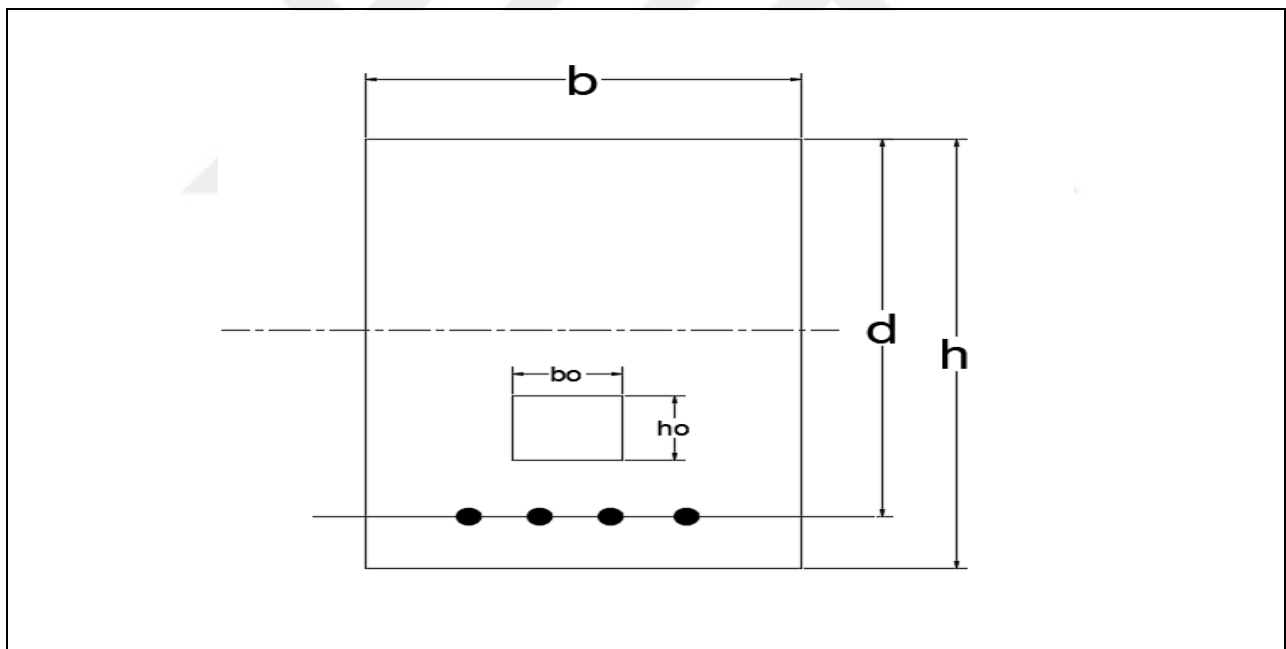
Uncracked Reinforced Concrete Beam With Rectangular Opening In Tension Zone
